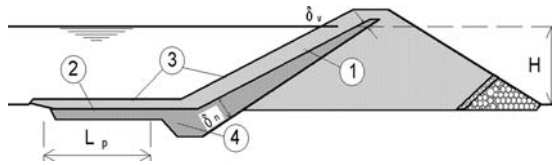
Dam with (1) Earth facing; (2) blanket; (3) protective layer; (4) cutoff trench.
